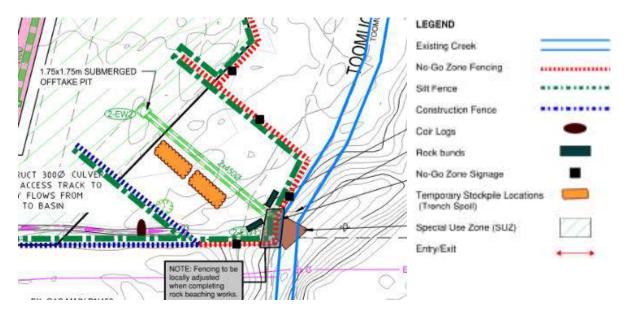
From SEMP - Drainage Outfall Works, Winslow Constructors, 6/11/24
